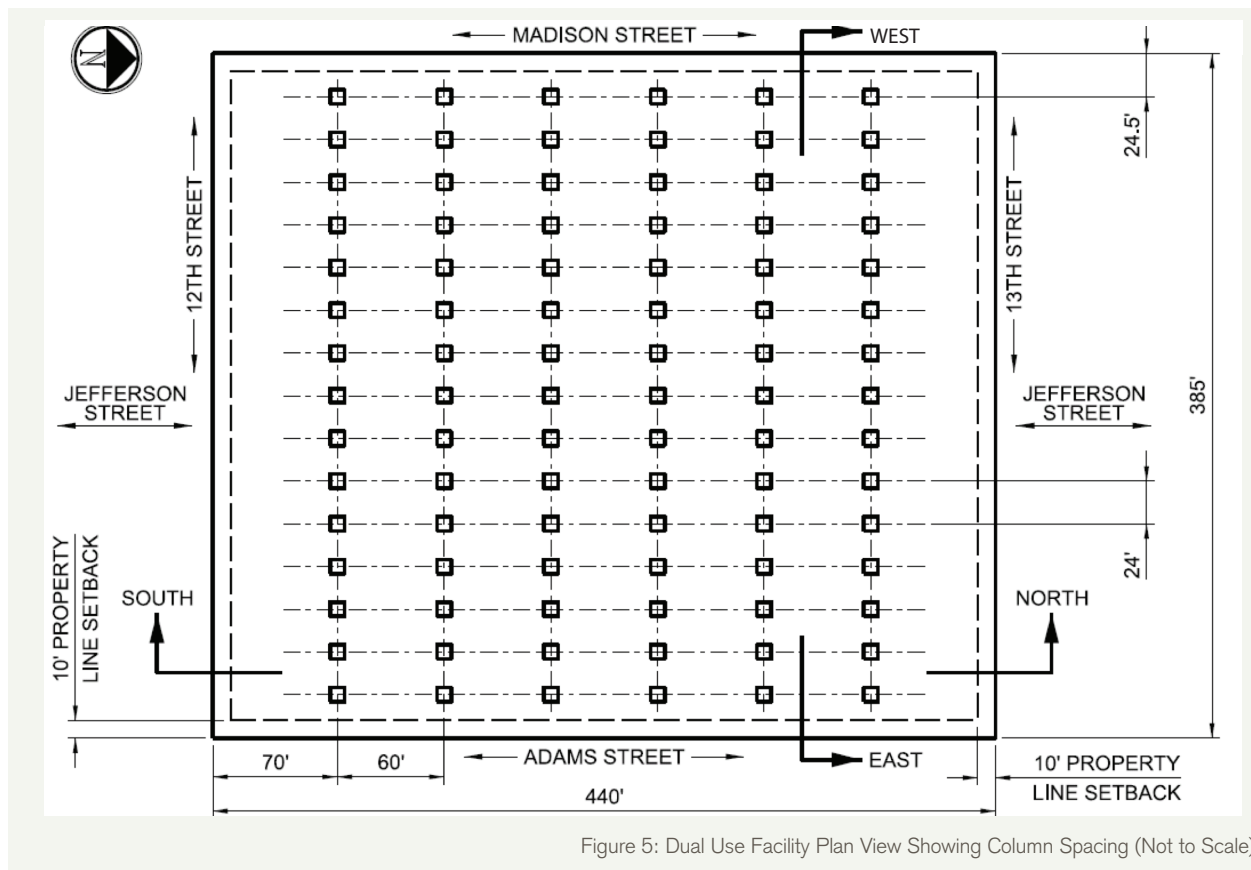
Dual Use Facility Plan View Showing Column Spacing (Not to Scale)
